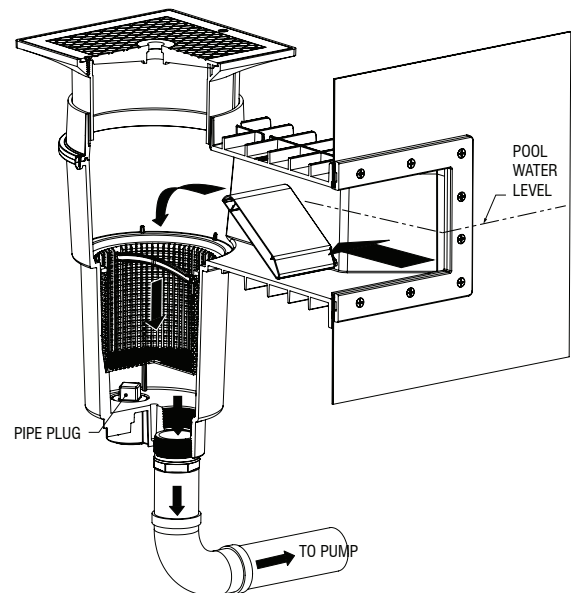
Skimmer installed with a separate line for the Suction Outlet Fitting Assembly (SOFA).
